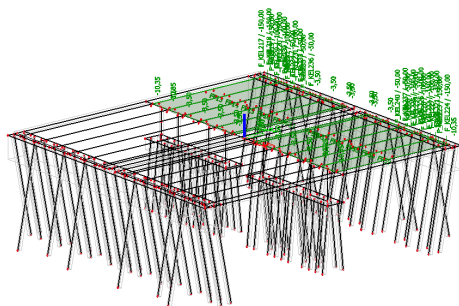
Governing load situation (load situation 4) for traffic loading on the FEM model for a two-span plate bridge
